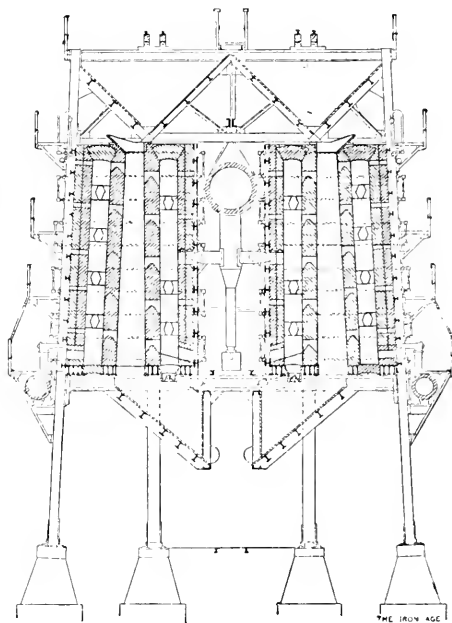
Sectional Elevation of the Ore Roasting Kilns, Showing Arrangement of Chambers.
